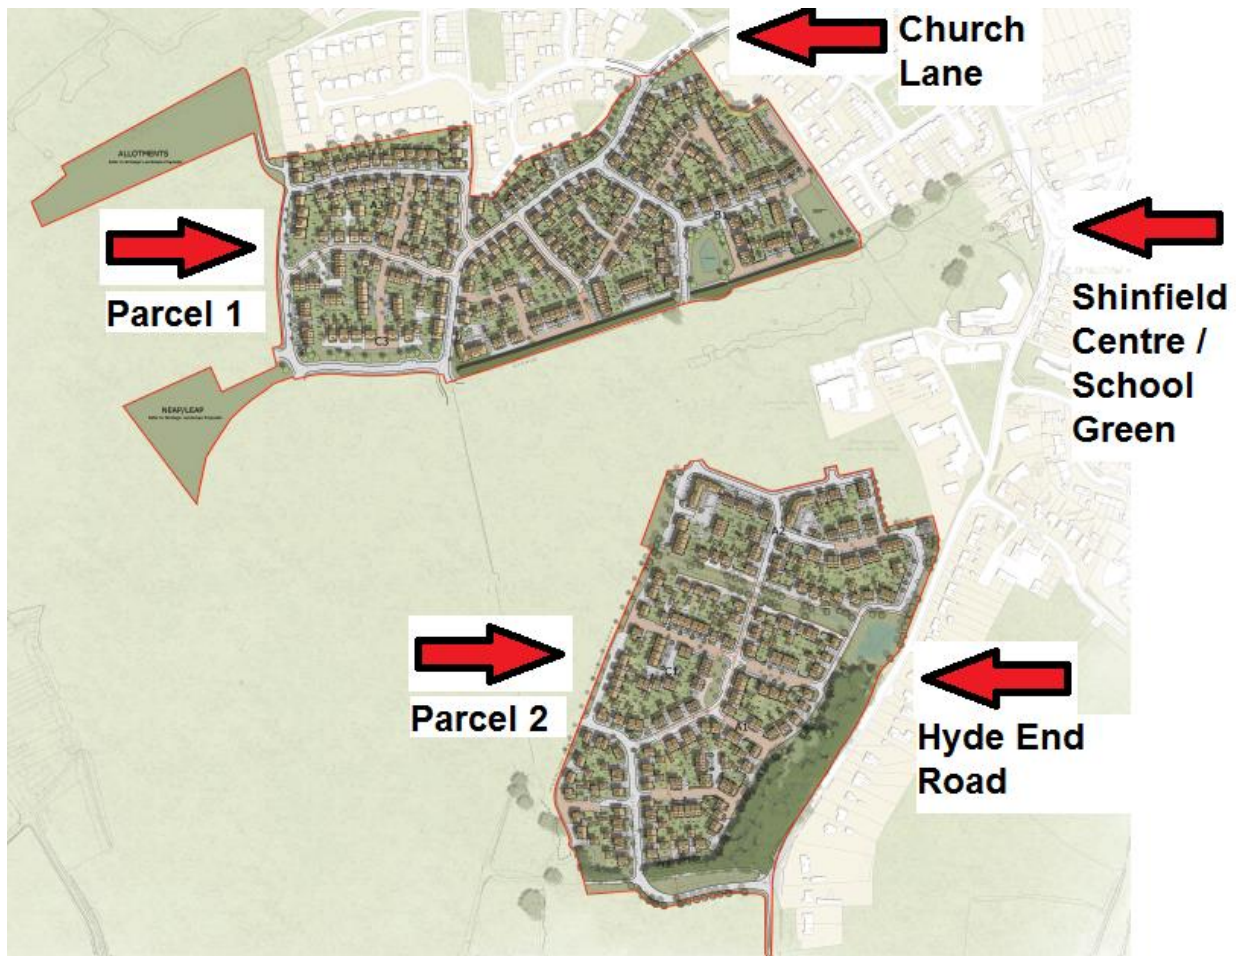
Development parcels and plan showing context of Shinfield West planning unit with Shinfield
